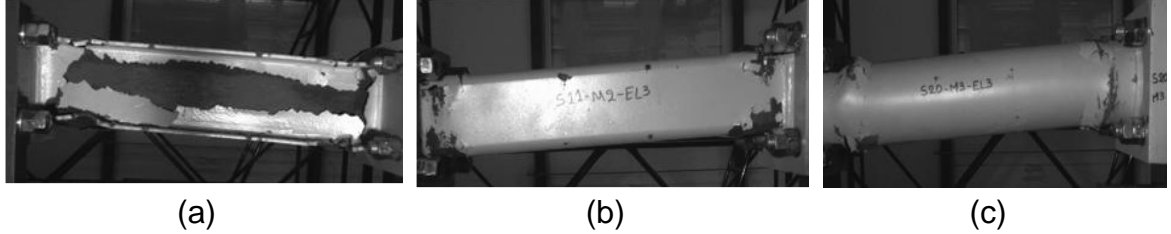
Photos of the deformed FUSEIS beam links: (a) IPE beams, (b) SHS beams, (c) CHS beams
